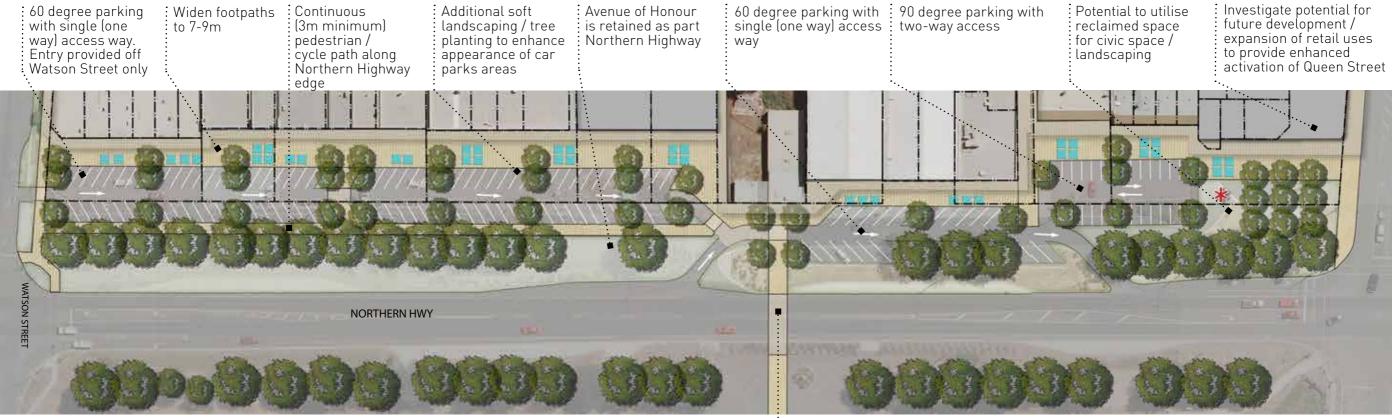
Proposed Retail Plan - Option 2 - Improvements within Private Land
